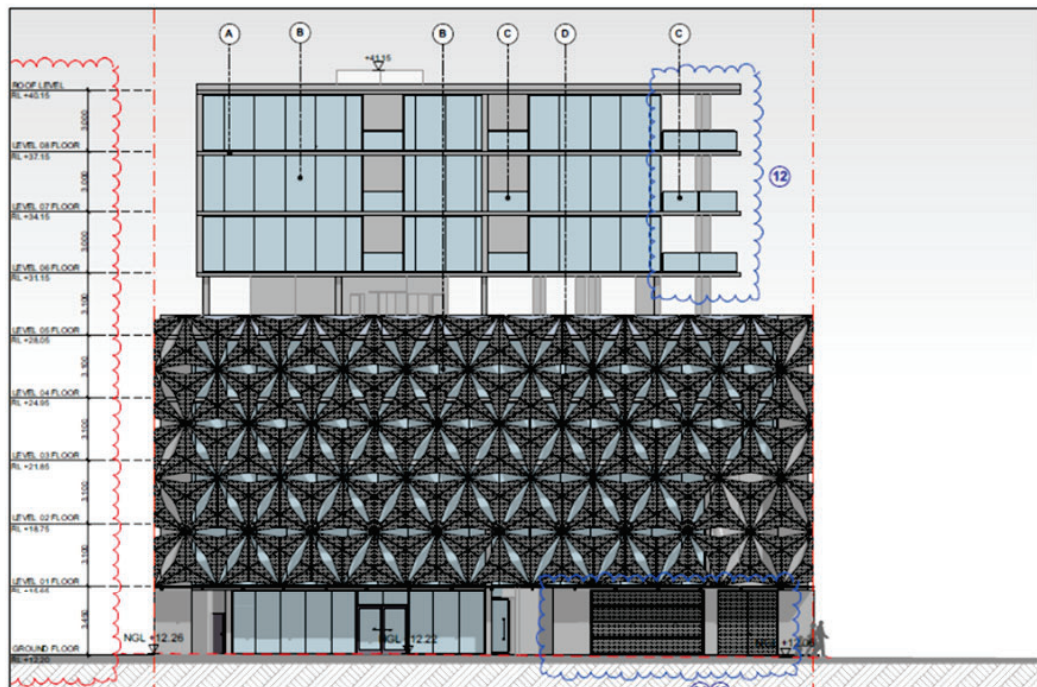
Proposed Elevation 01 (east facade) of subject building.
